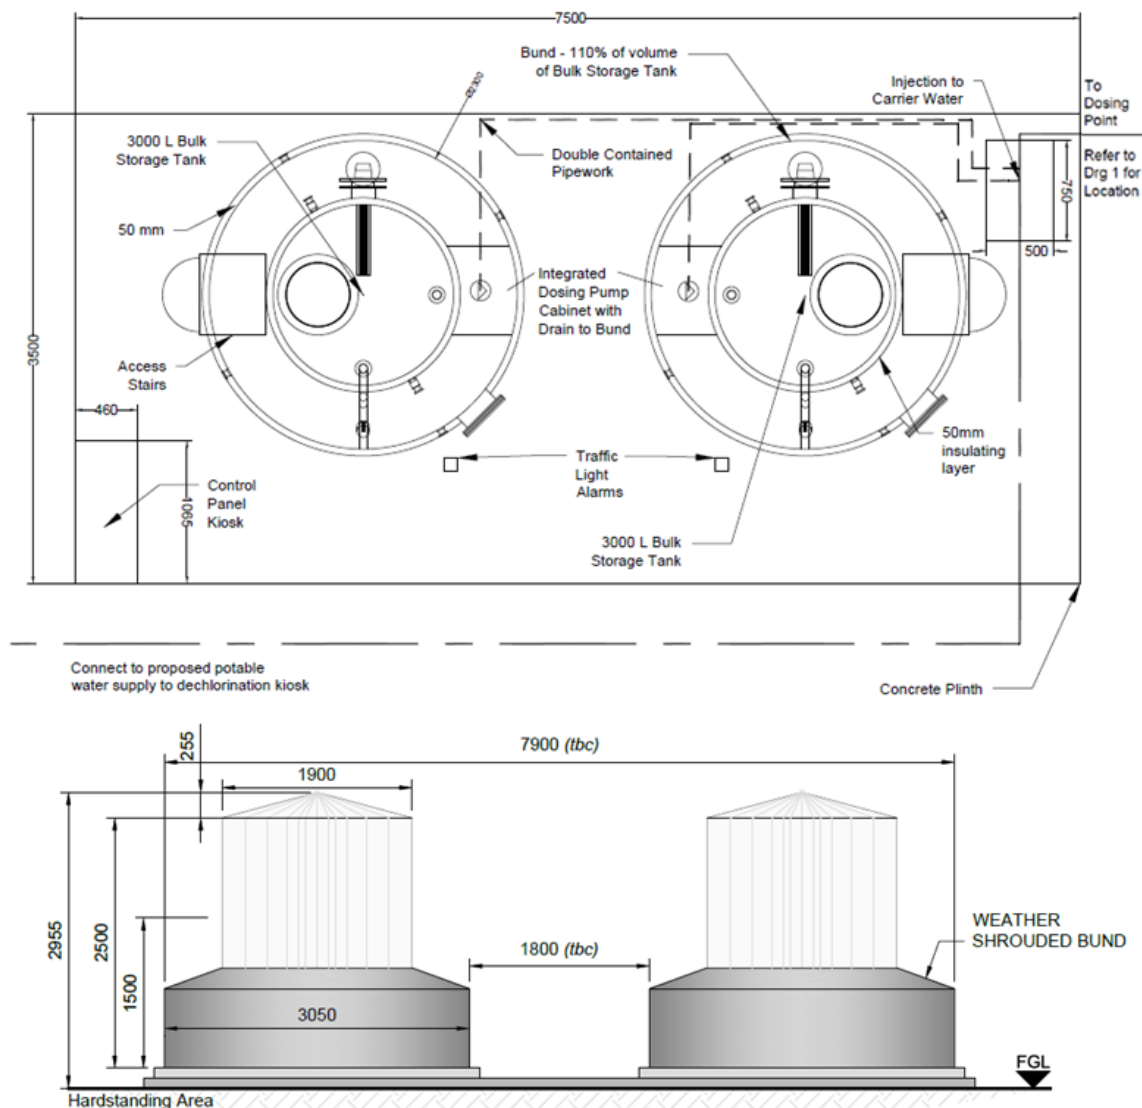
Plan and Elevation Drawings of a typical Orthophosphate Dosing Unit
